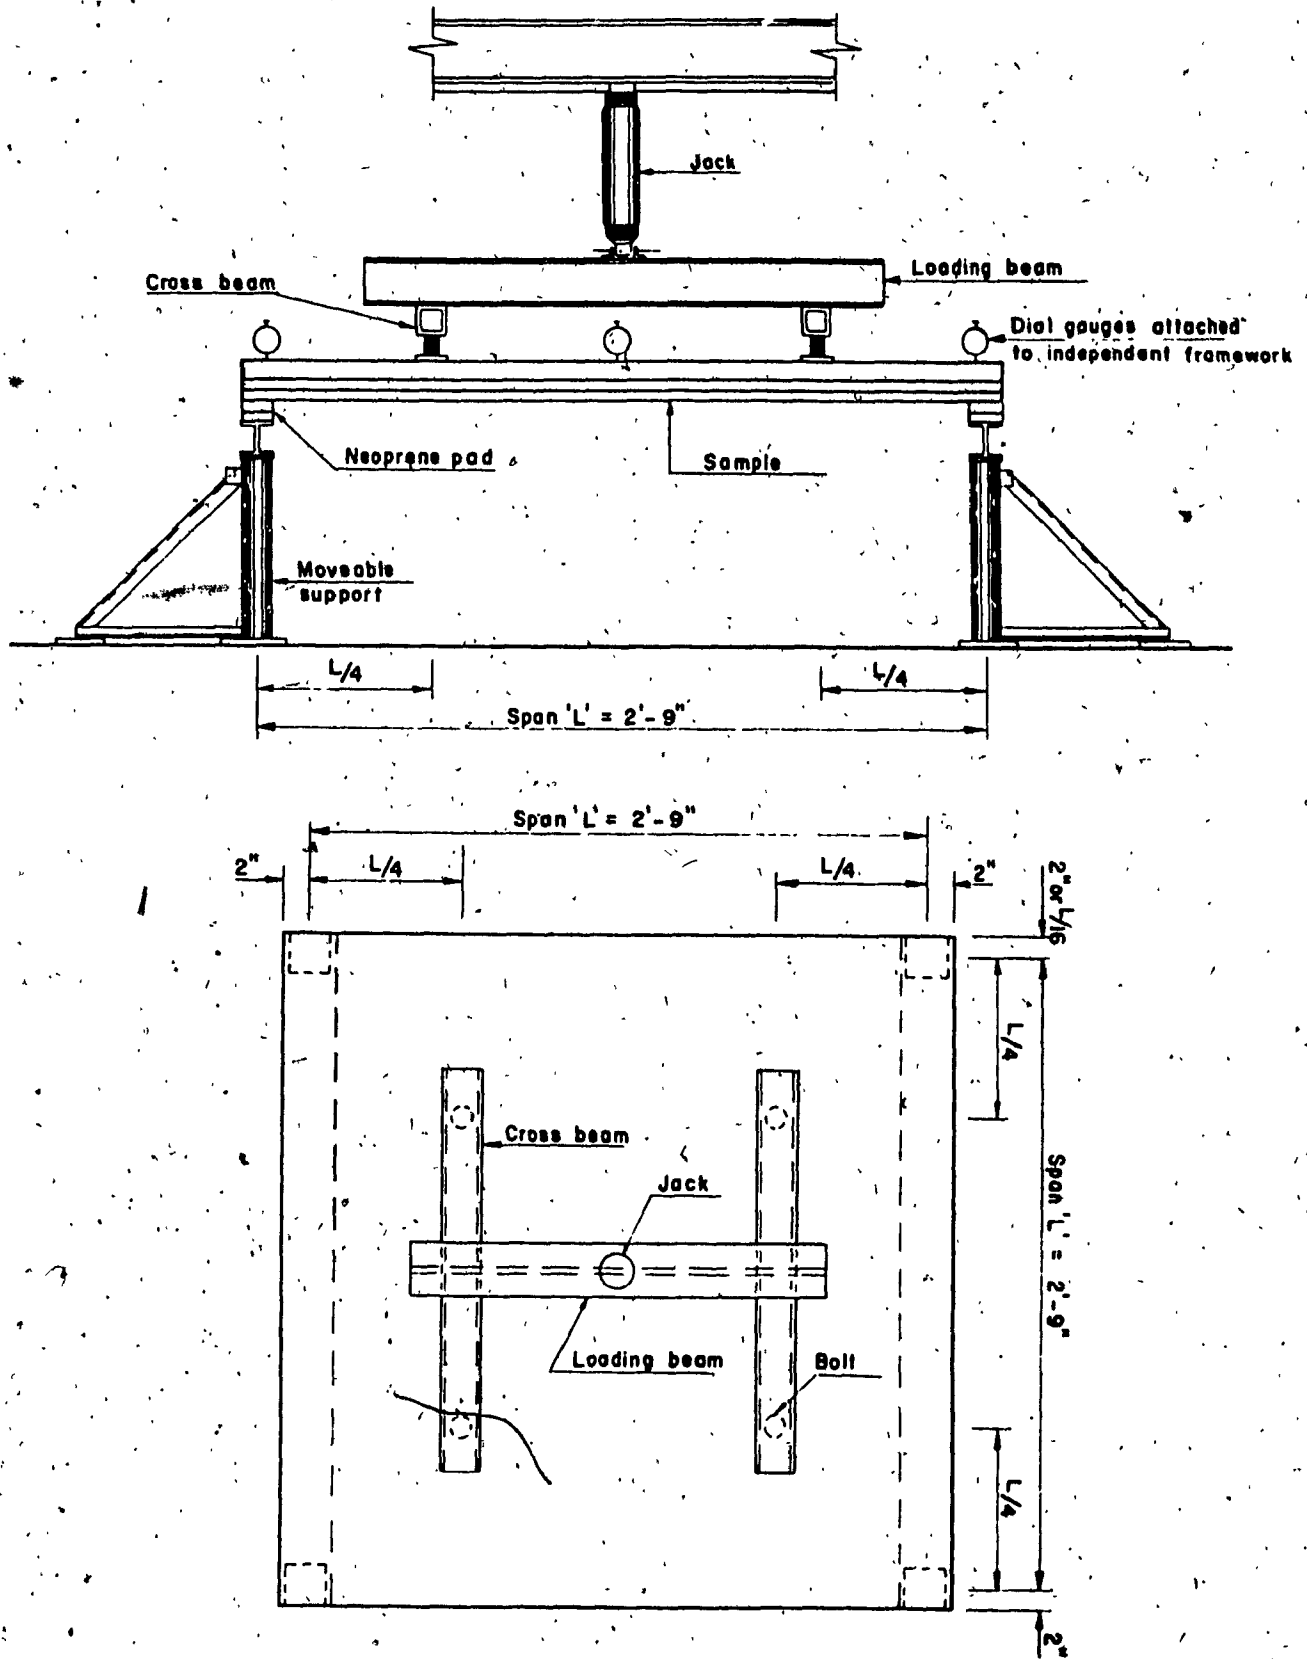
Testing arrangement for granite pavers: (a) side view; (b) plan view
